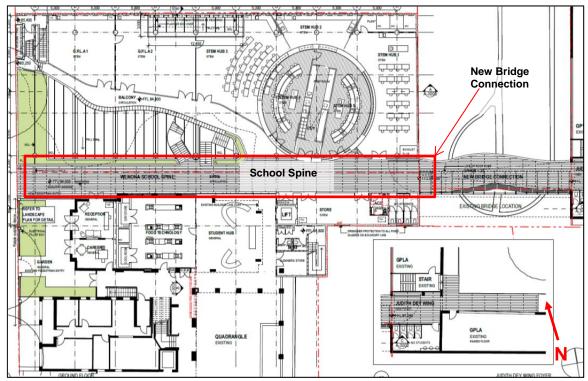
Ground Floor Plan showing new STEM hubs, school spine and new bridge connection (Source: EIS)
